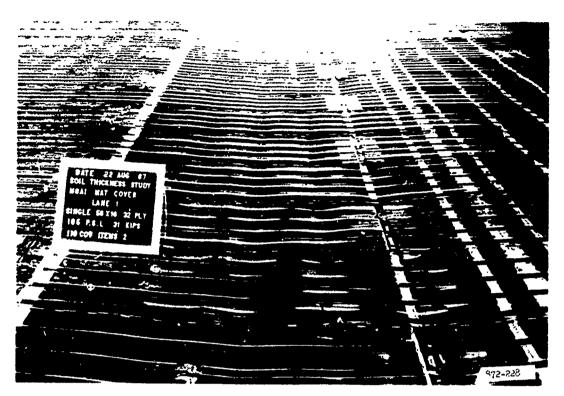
Deformation of 3.2 in. in test section I, lane 1, item 1, after failure at 30 coverages
